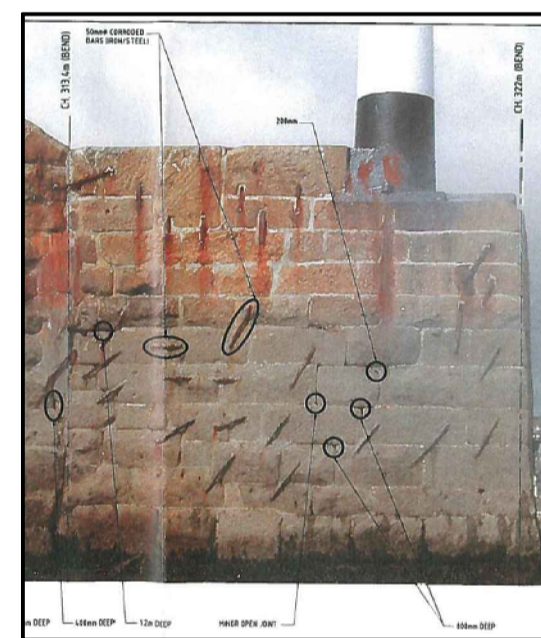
Western Section of the Lighthouse Pier (Southern Face)
